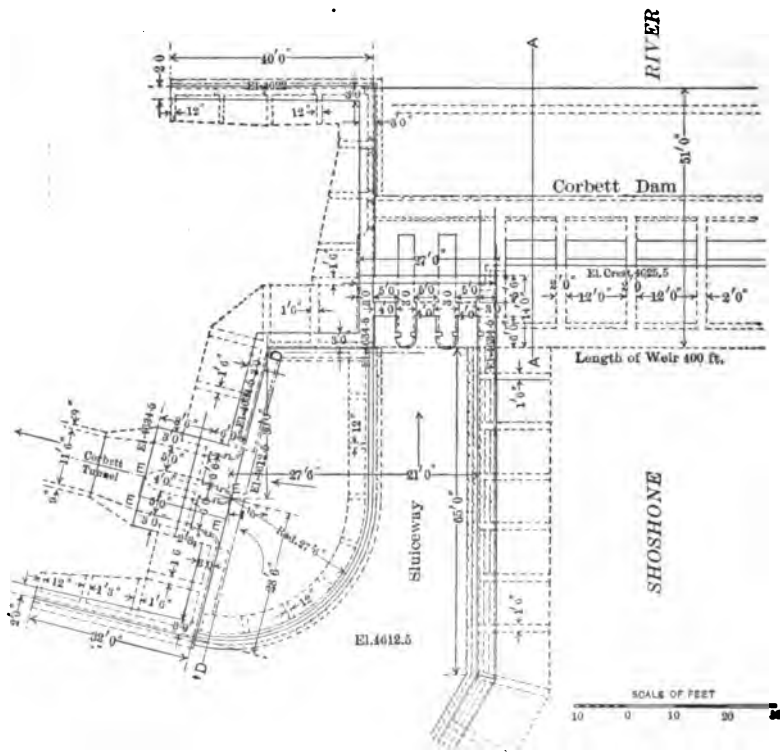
Plan of Corbett Dam and Headworks, Shoshone Project, Wyoming.
